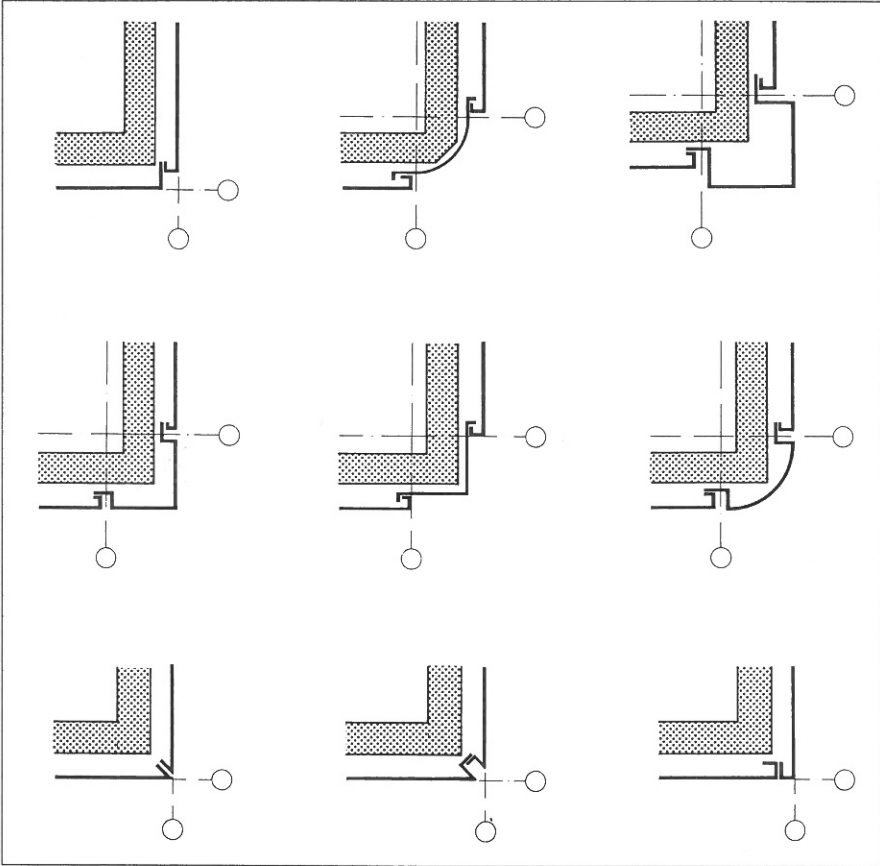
Examples of corner structures, schematic drawing. The separate corner component can be formed without panels, or using a long profile or else it may be made up of panels according to the scheme of horizontal panel distribution
